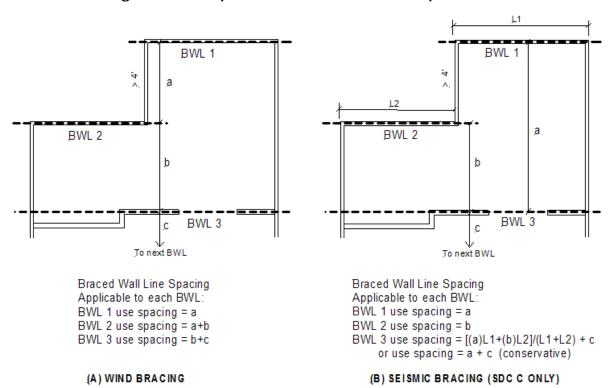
Braced Wall Line Spacing for a Series of Braced Wall Lines
